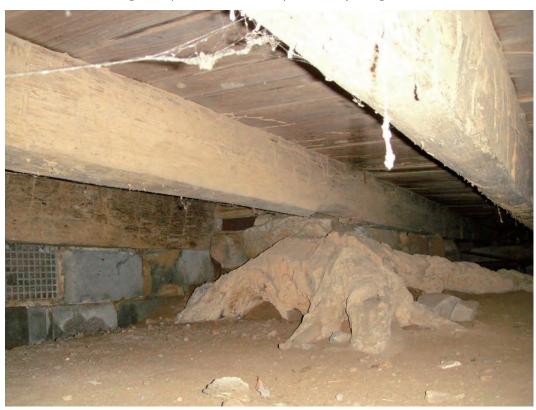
Detail at Crawl Space. Note: Floor joists are supported by a mix of rock outcroppings and some irregularly spaced piers.
